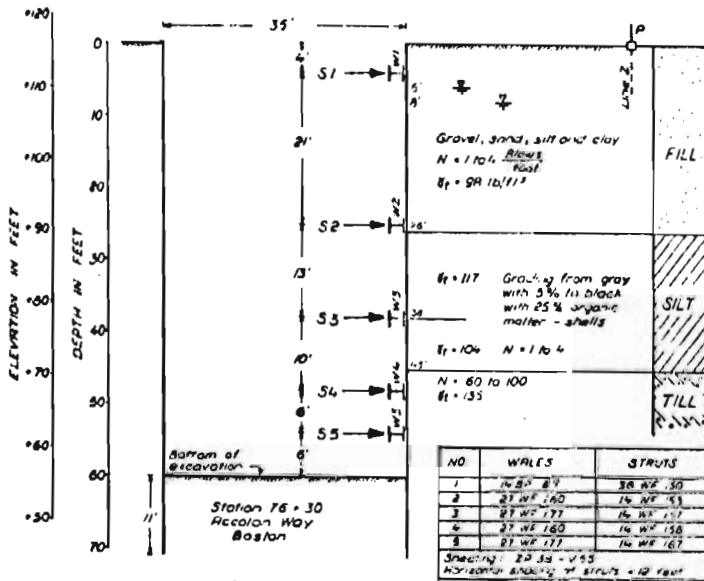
CROSS SECTION OF BRACED EXCAVATION
